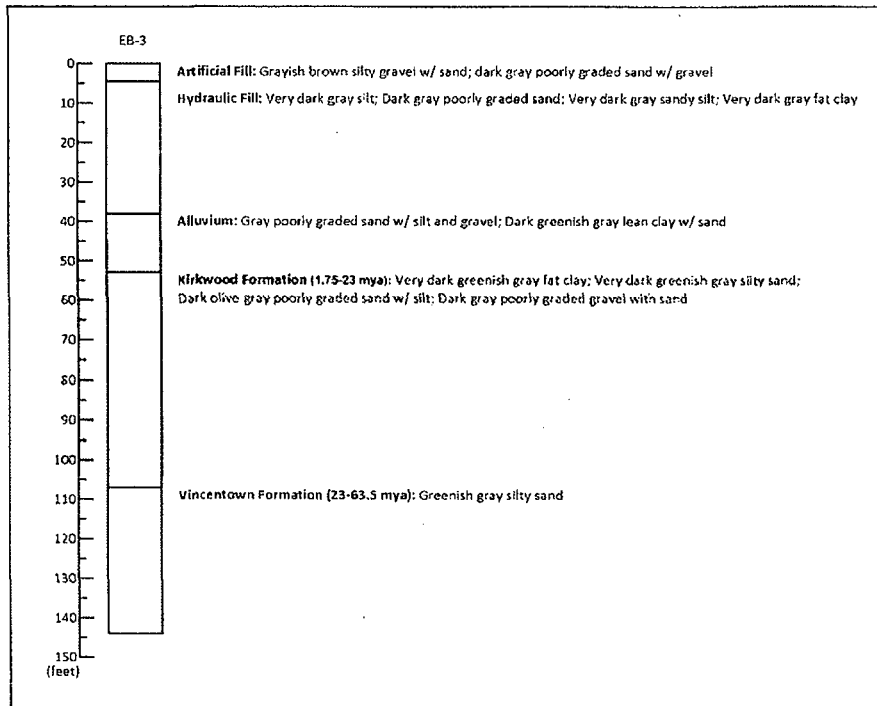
Partial Soil Profile Showing Soil Strata at Boring EB-3 (Surface Elevation 16.5 NAVD88)
